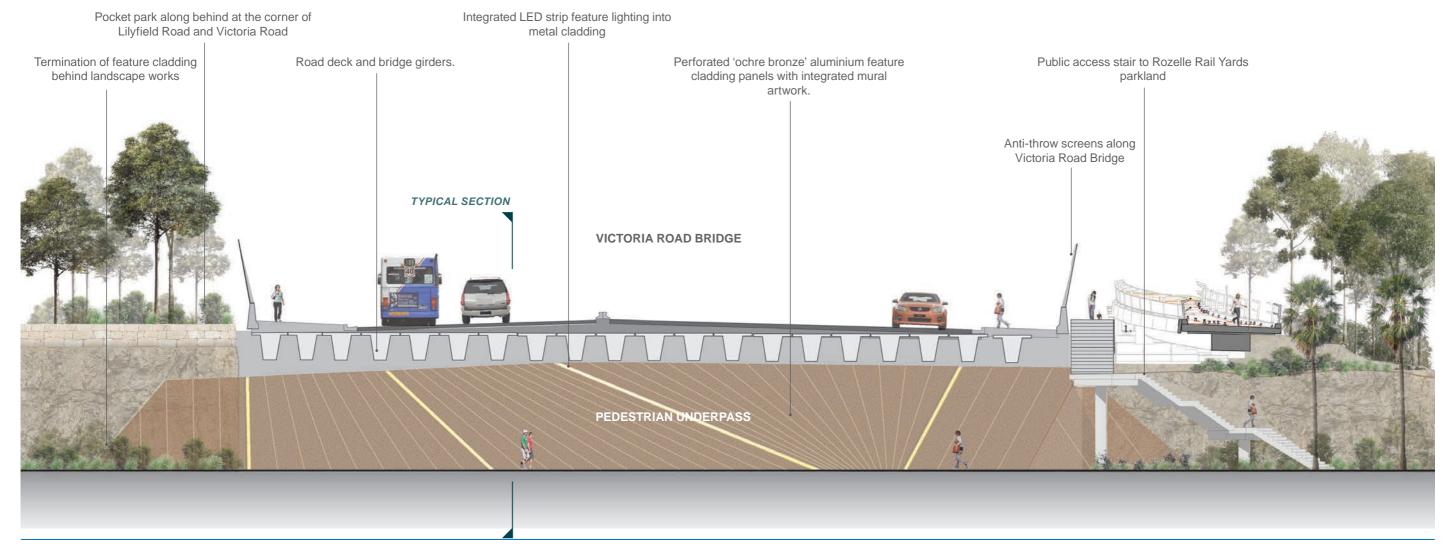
Section 3 - Bridge over Rozelle Rail Yards. Section
